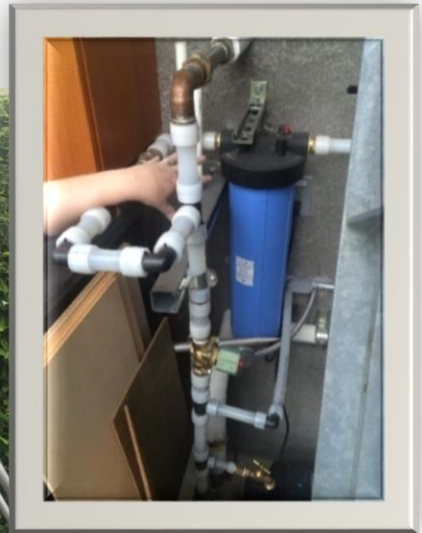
and 23: Downspouts: Connections from gutters to the building interior
